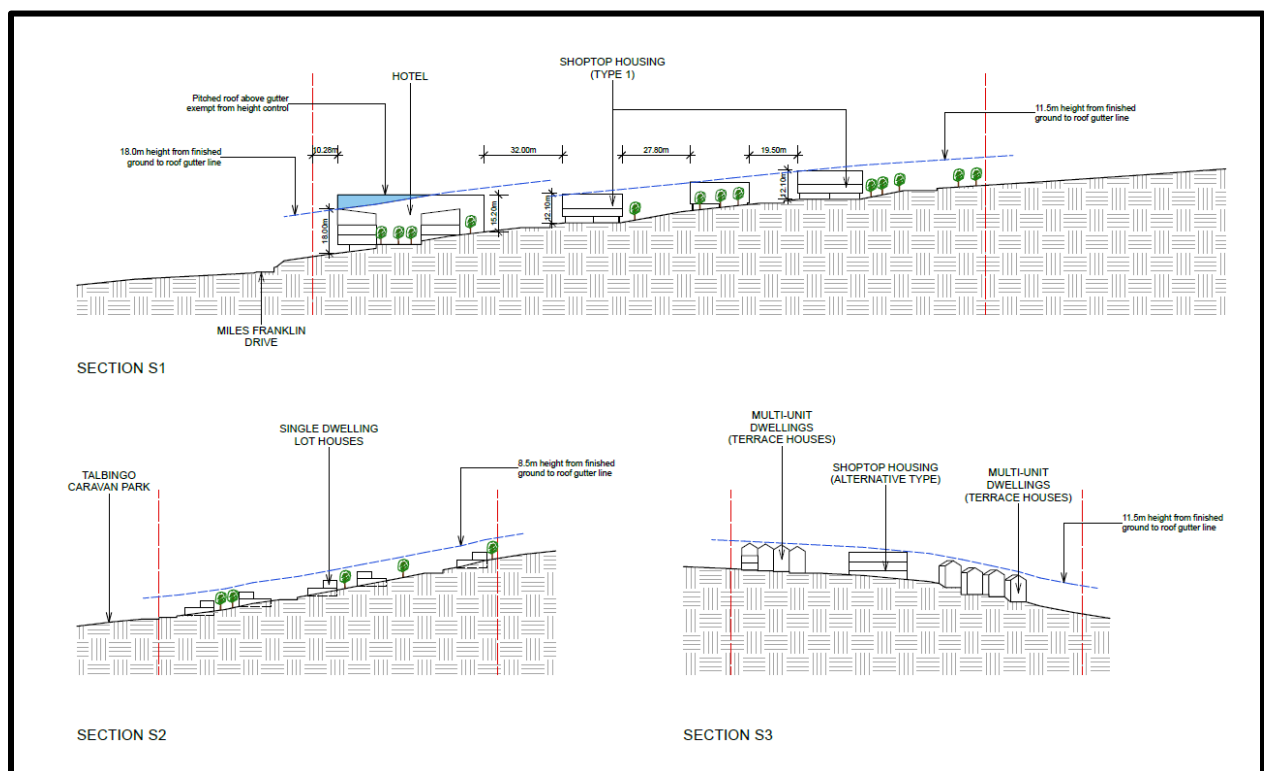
Site Sections (Source: Robert Harwood Architects)
